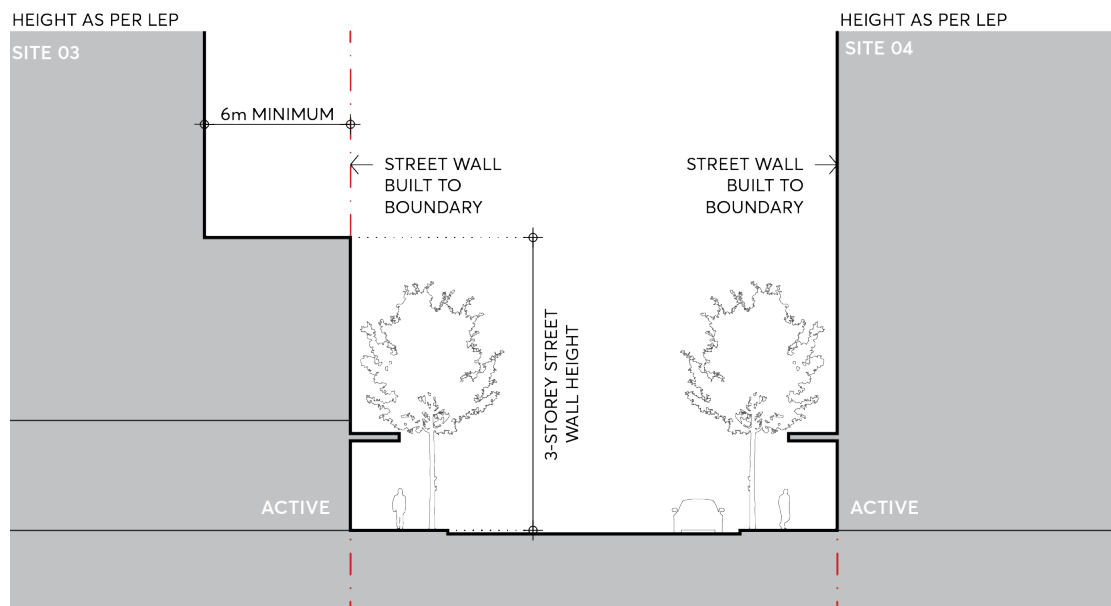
Marion Street (Section A) Setbacks and Street Wall Height
